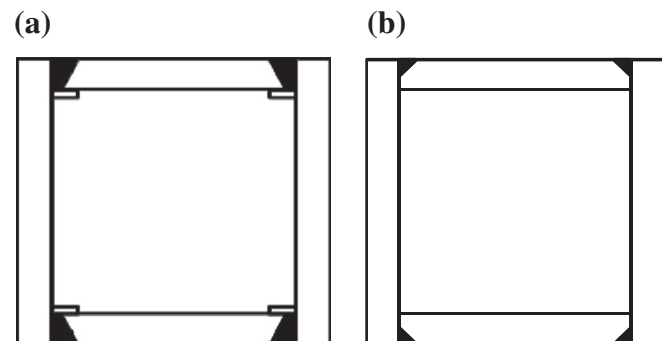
Sketch of welded steel box columns: (a) complete-joint-penetration groove weld (CJP) box column; (b) partial-joint-penetration groove weld (PJP) box column.
